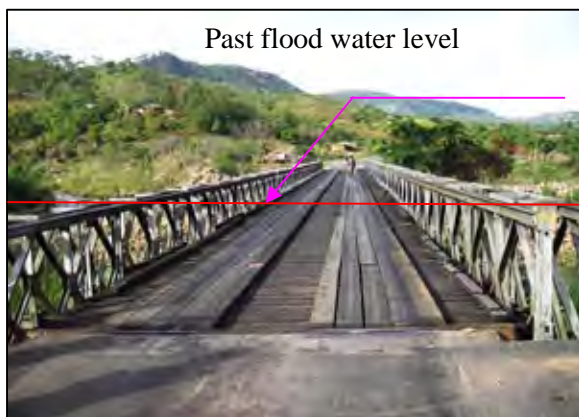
Past Flood Water Level of the Existing Rukuru Bridge
